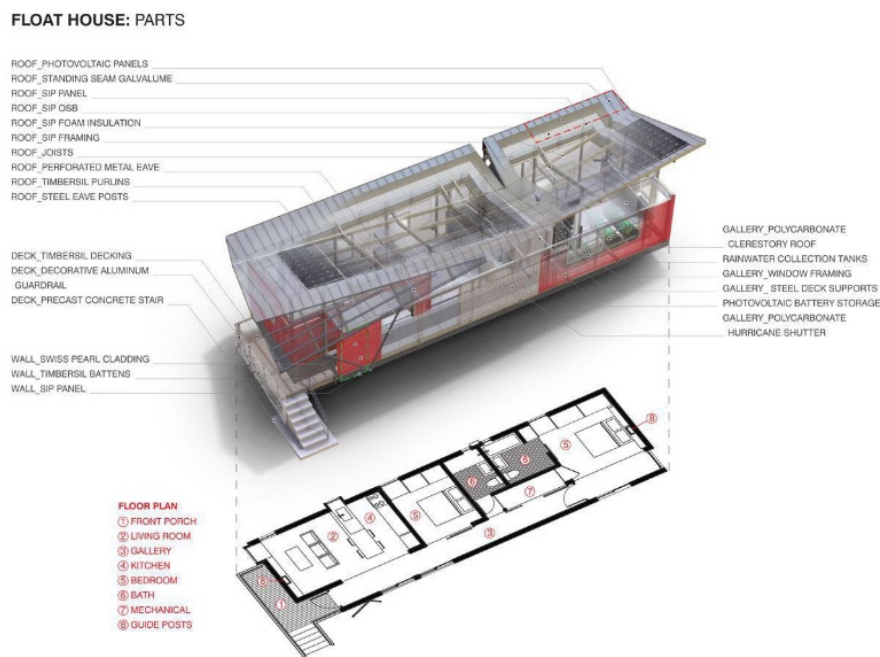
Parts of Float House (Drawing by Morphosis Team) [13]
